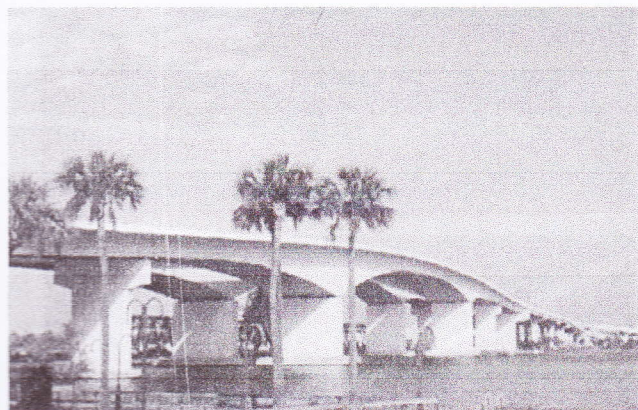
Typical RC bridge over water which must be designed for durability
